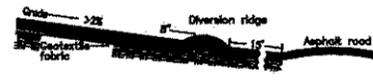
Temporary gravel construction entrance/exit with diversion ridge where grade exceeds 2%.
